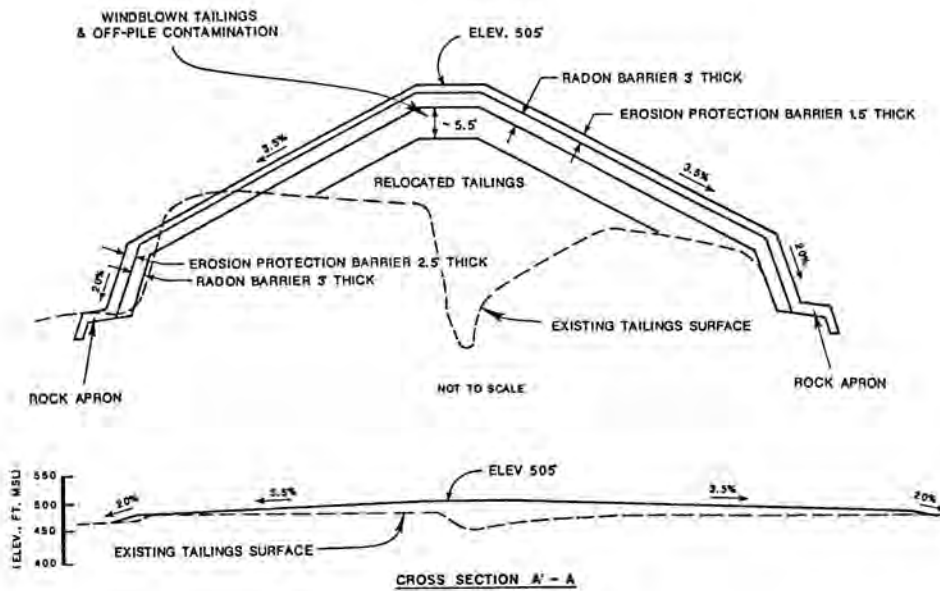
Typical Cross Section for the Proposed Stabilized Embankment Falls City Tailings Site, Near Falls City, Texas.
